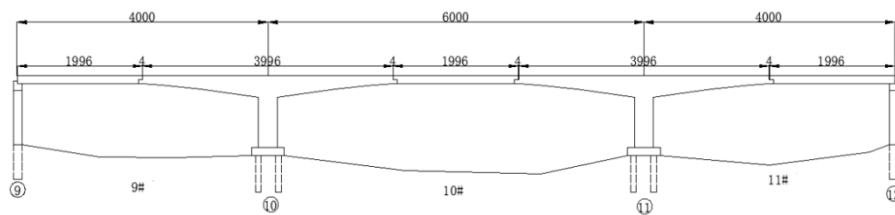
Elevation Schematic Diagram of an Old Bridge.
